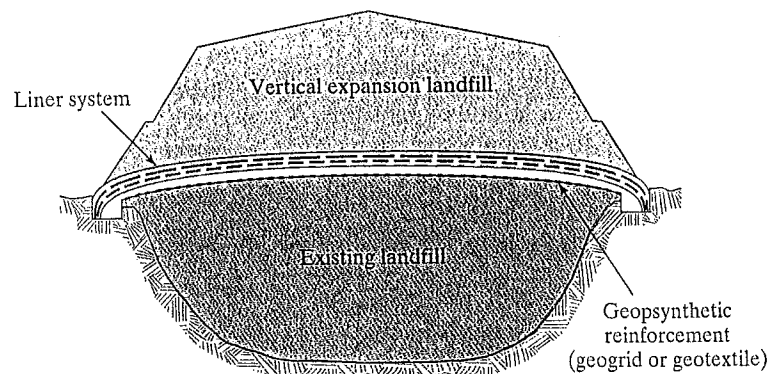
Cross Section of a Piggyback Vertical Expansion Landfill
